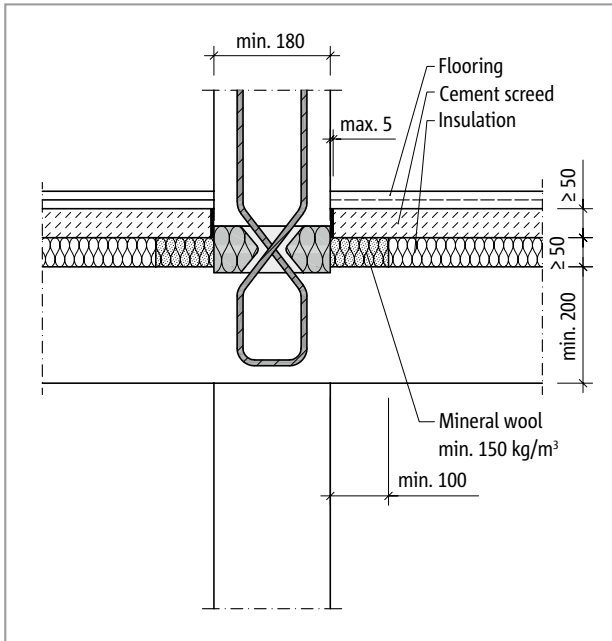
Schöck Sconnex® type W: R 120 / EI 120 with internal wall and above-slab insulation
